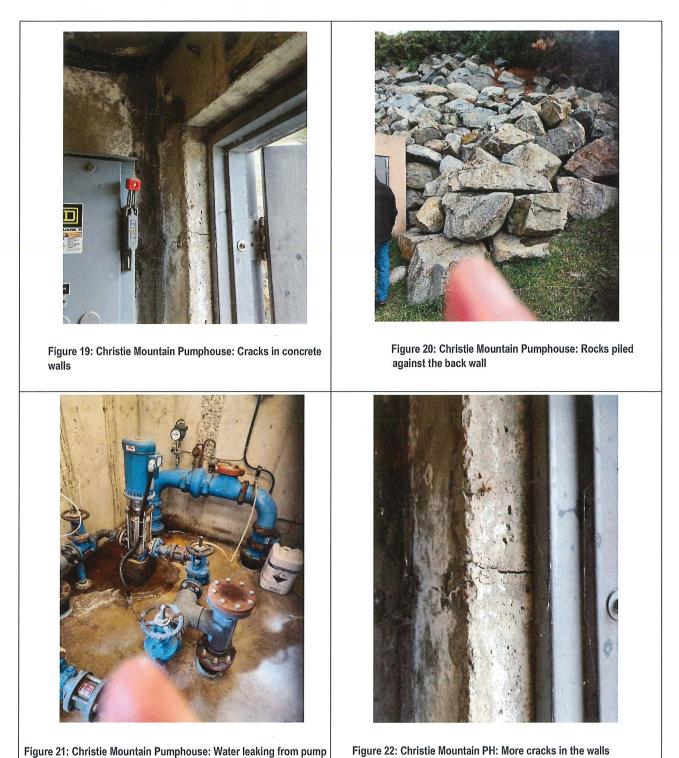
Christie Mountain PH: More cracks in the walls
